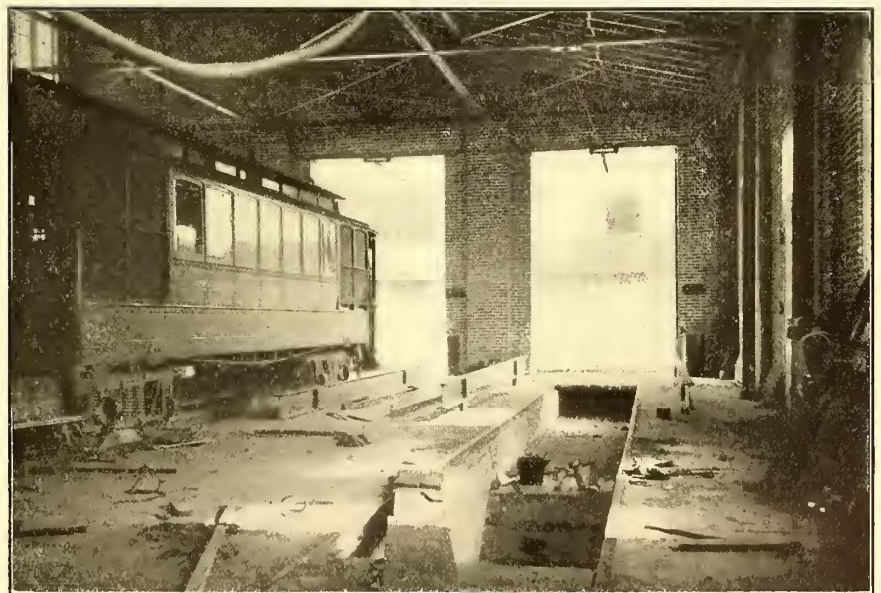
SHOWING PITS FOR INSPECTION AND HOIST MOTOR PIT
